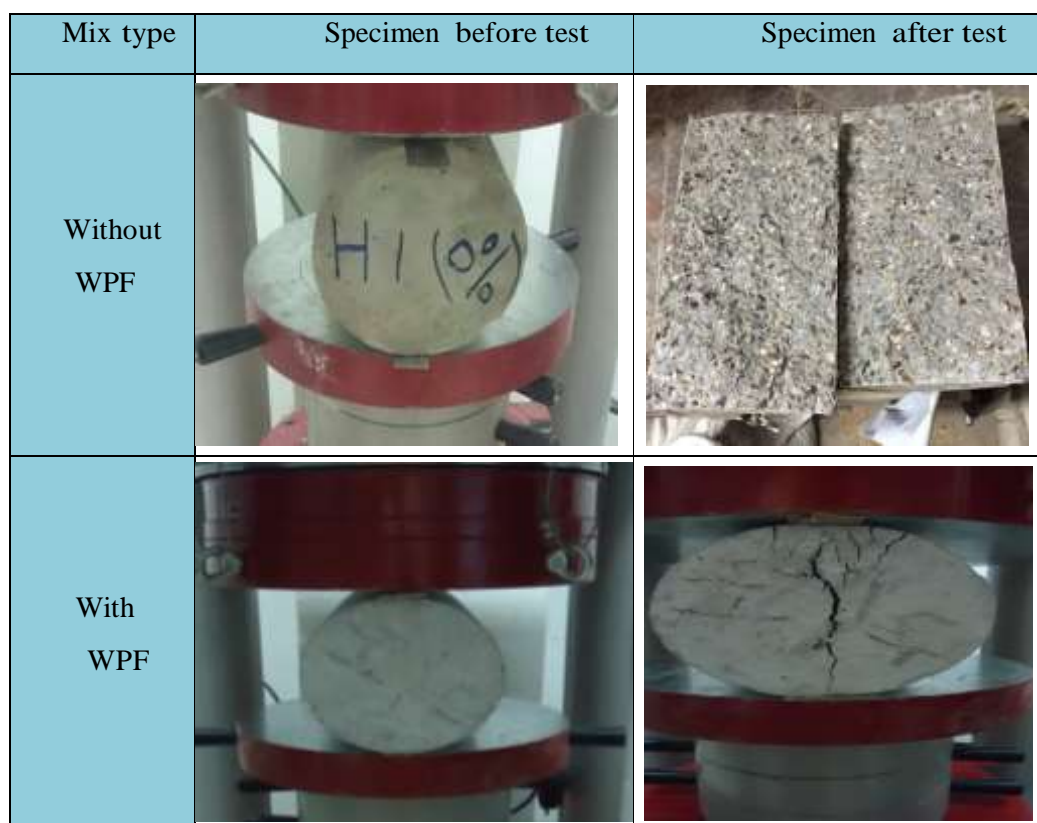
The 150x300 mm concrete cylinders tested for splitting tensile strength
